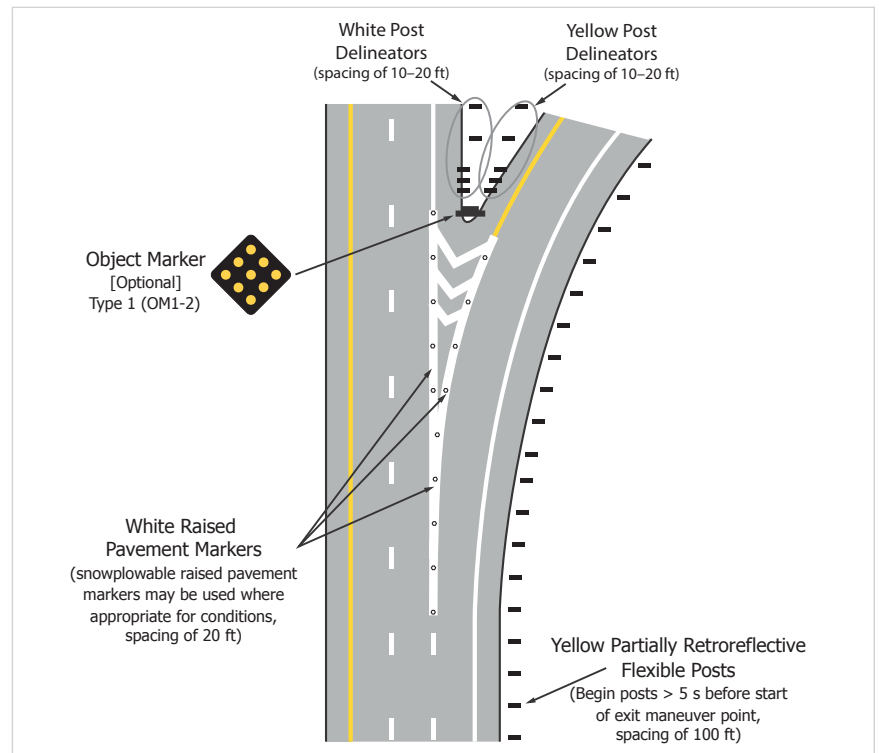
Recommended raised pavement markers and post-mounted delineators at an exit gore
